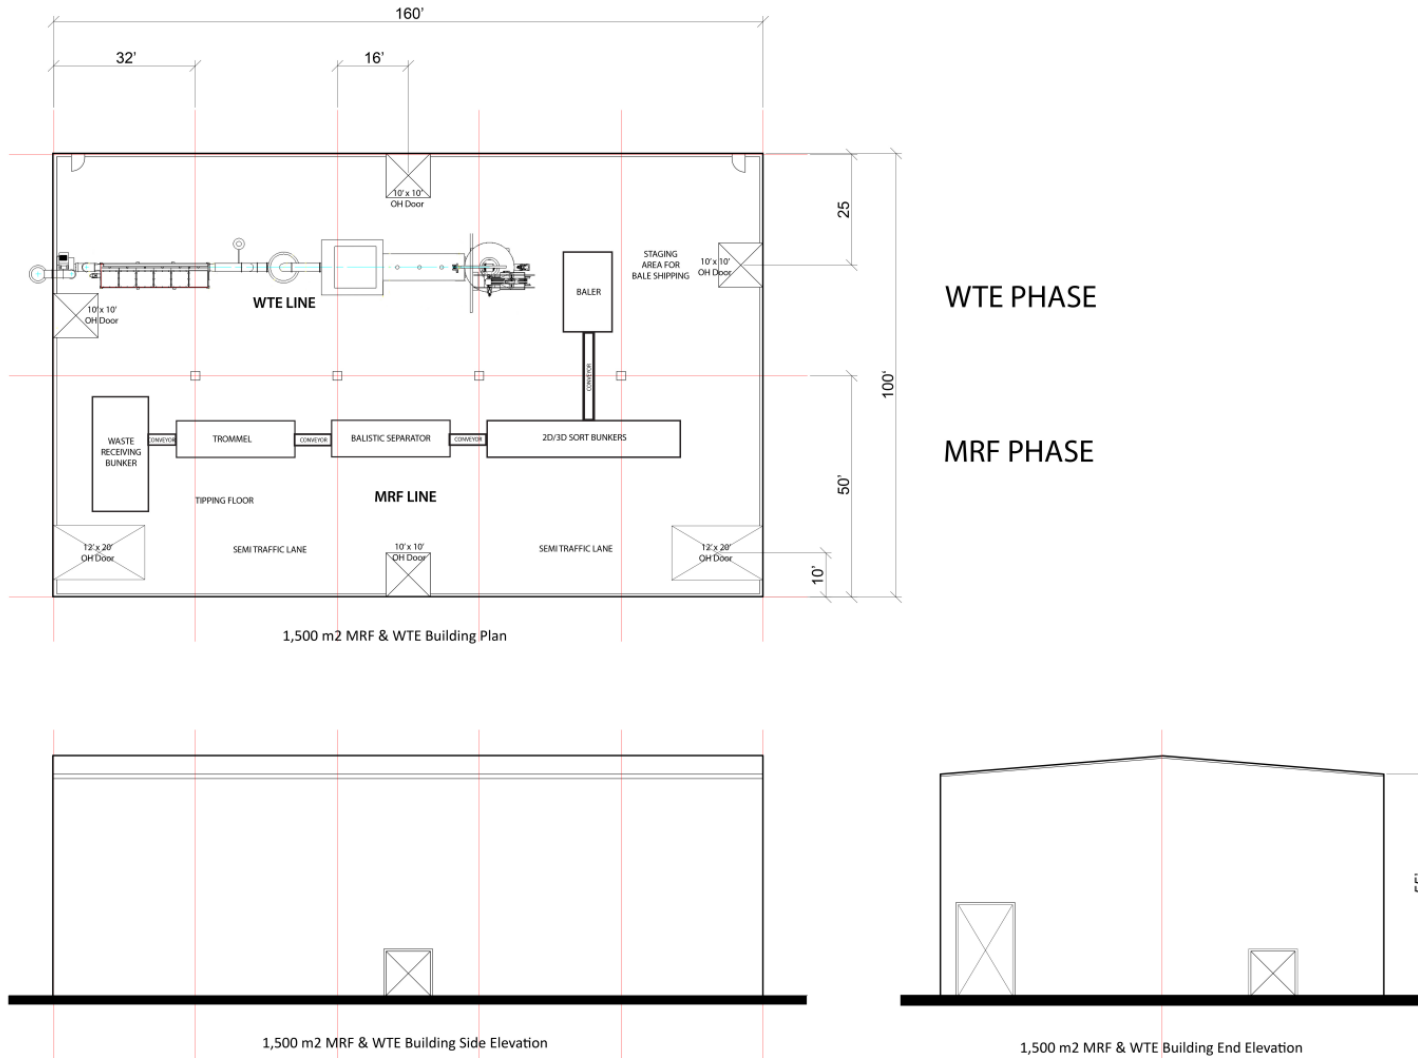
Preliminary Drawing - Plan and Elevations for 1500 m2 Building
